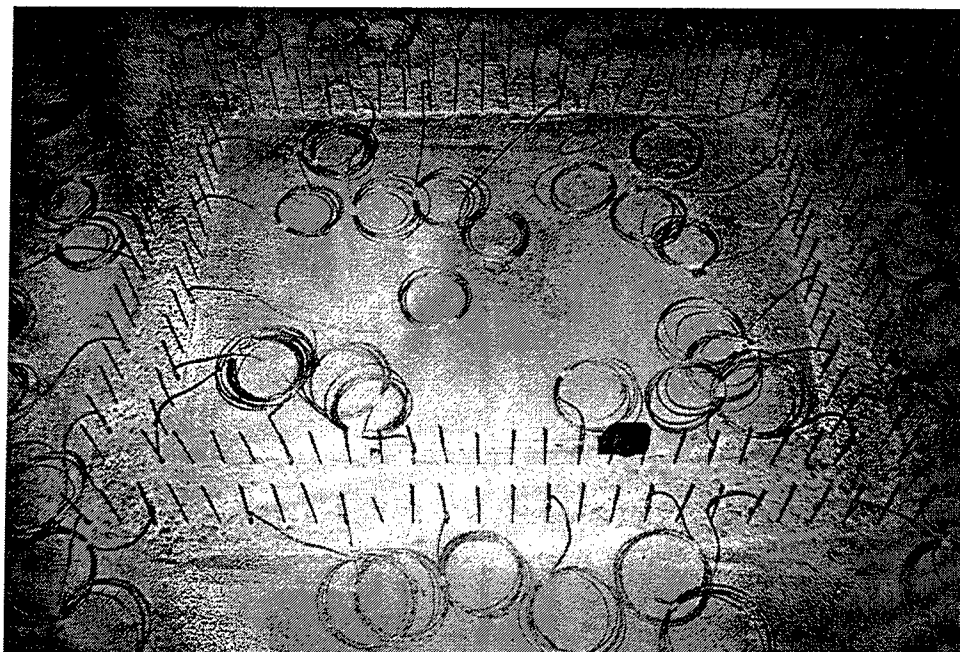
View of model reinforcement, after base slab concrete placement, ITS-2.
